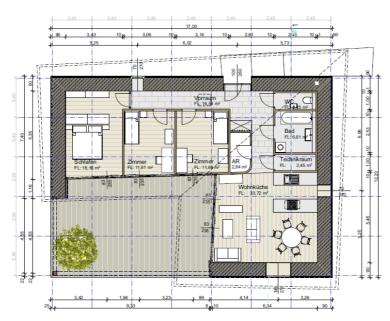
Floor plan of the atrium-style building based on the preliminary design (Arch. Scheicher)
